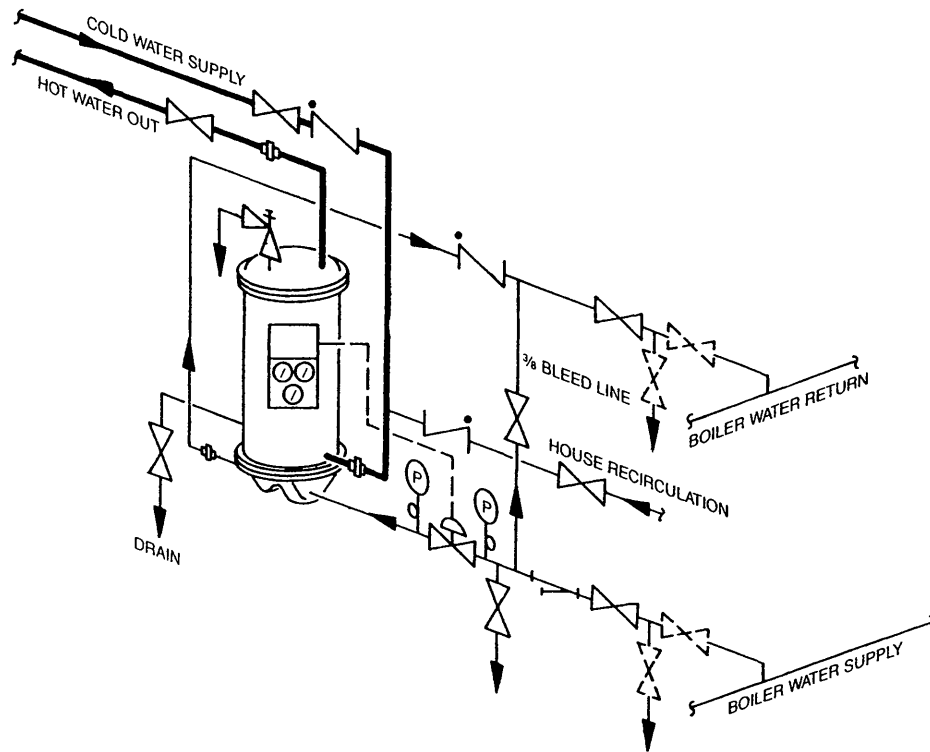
Piping Connections for a Single Water to Water Heater with a 2-Way Control Valve
